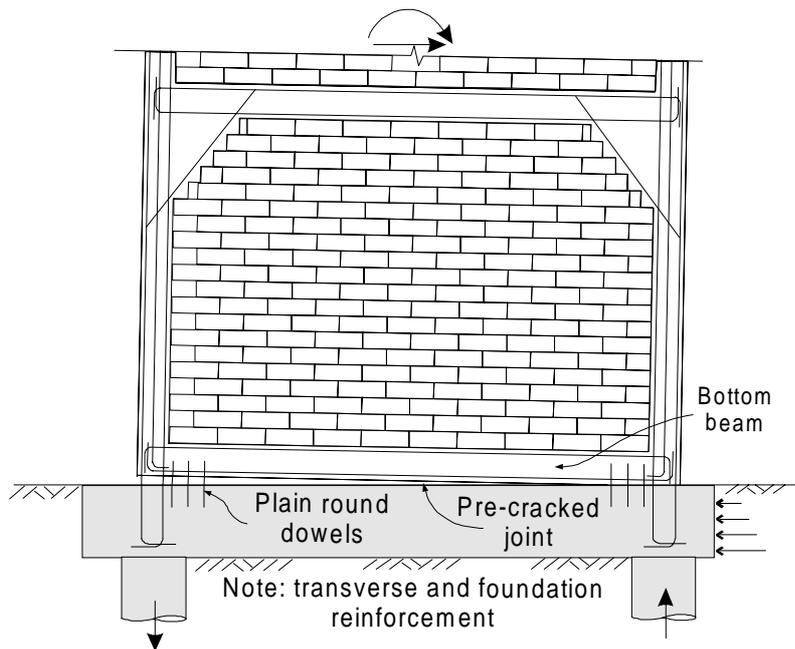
Recommended design of infilled frames with a pre-cracked connection.
